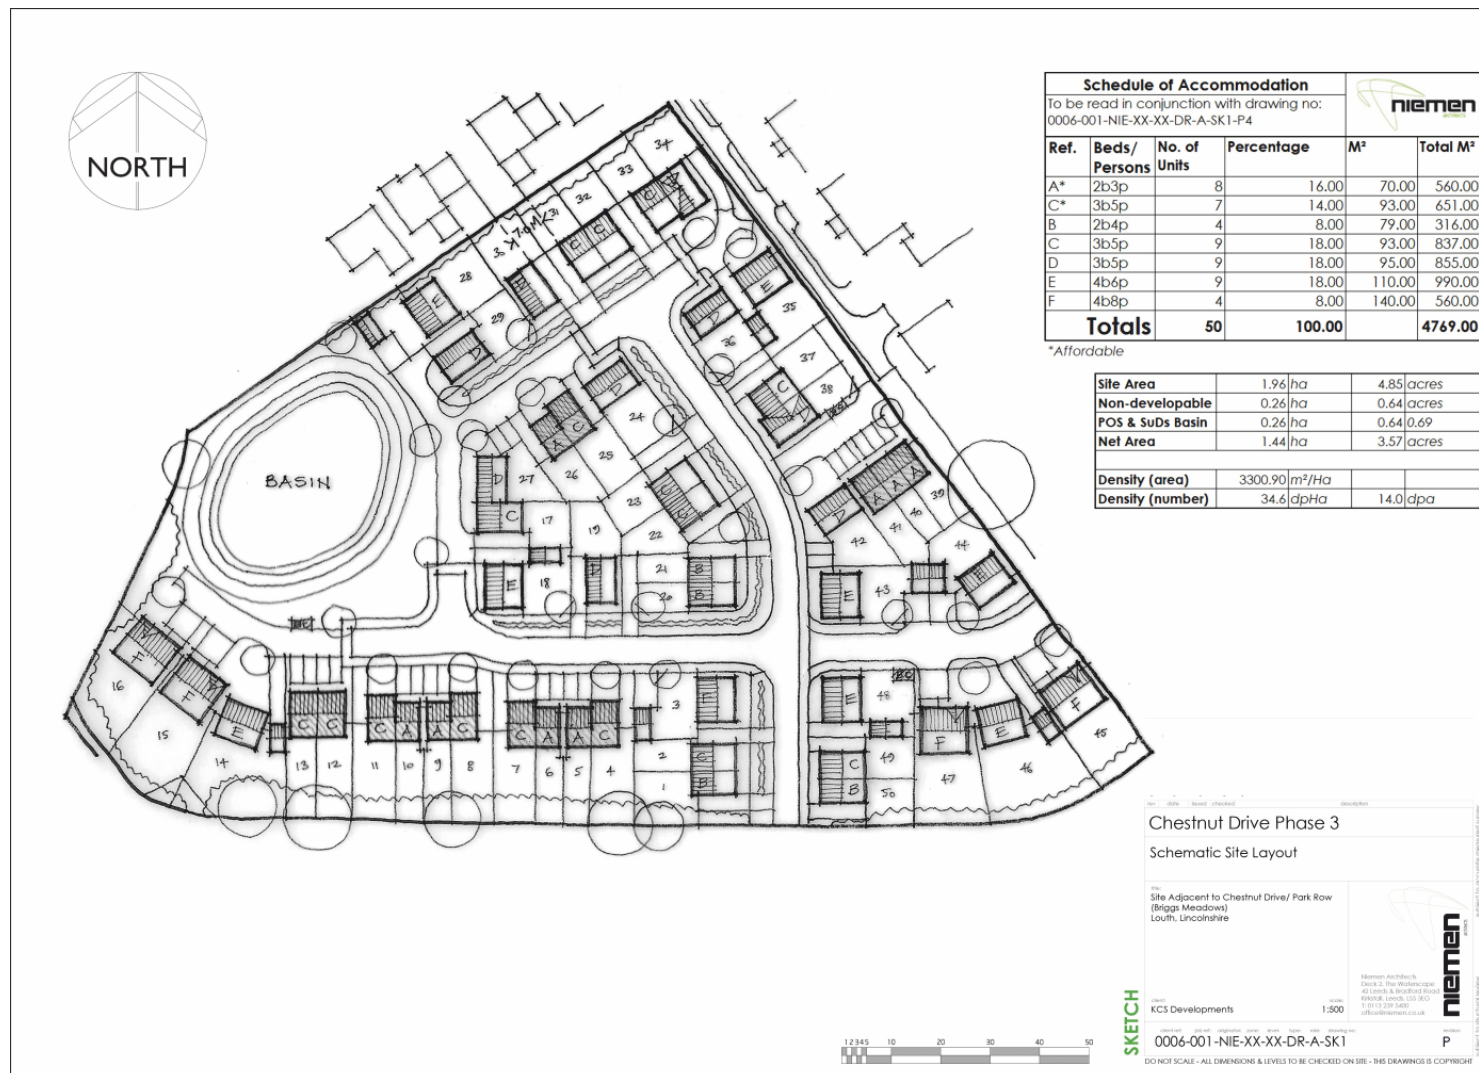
Briggs Meadow, Park Row, Louth. Concept site layout (Drwg Sk1 rev. P, Nieman Architects)
